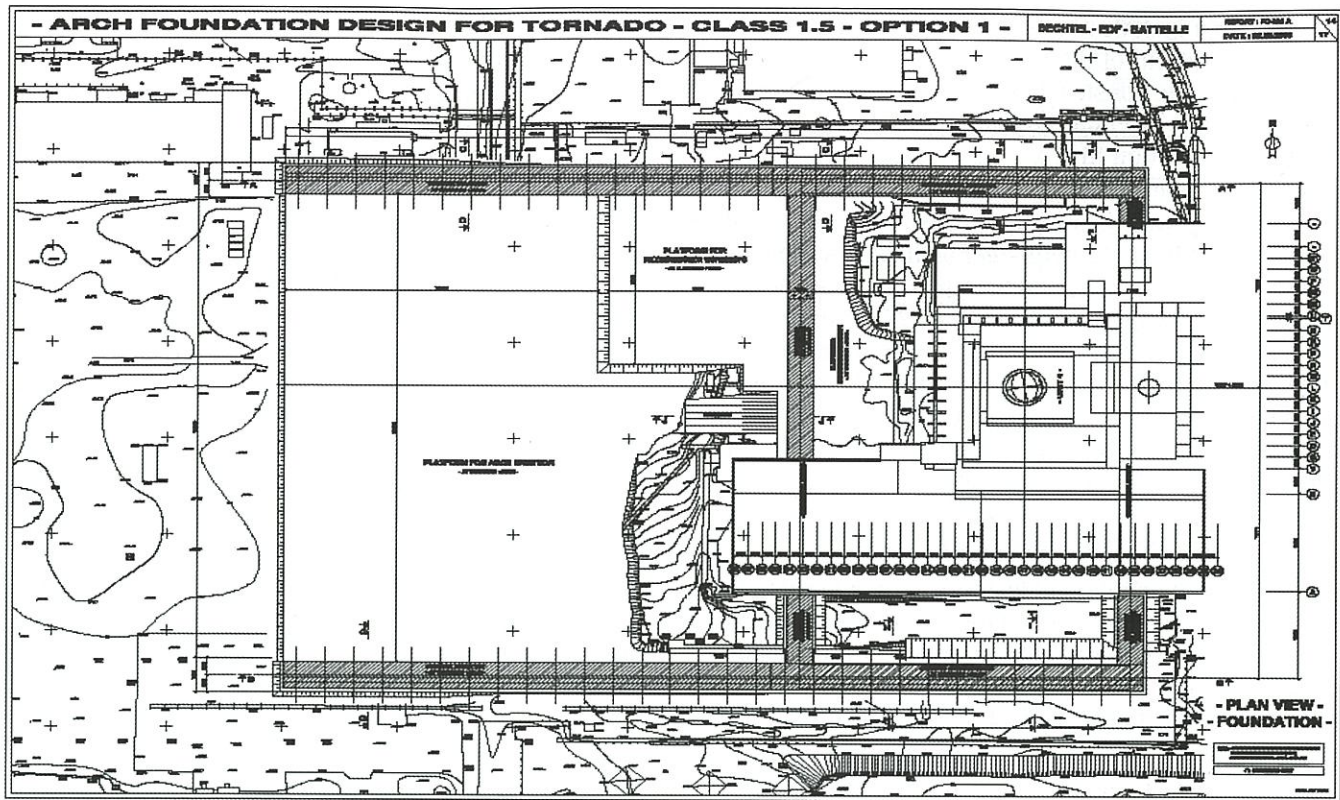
Site Plan and Topographic Drawing, illustrating foundation and assembly area locations.
